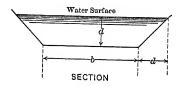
(Part 1 of 3).—Hydraulic Elements of Trapezoidal Sections.
